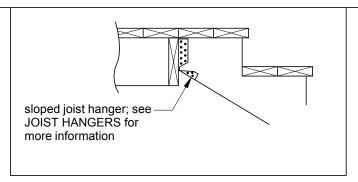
STAIR STRINGER ATTACHMENT DETAIL
